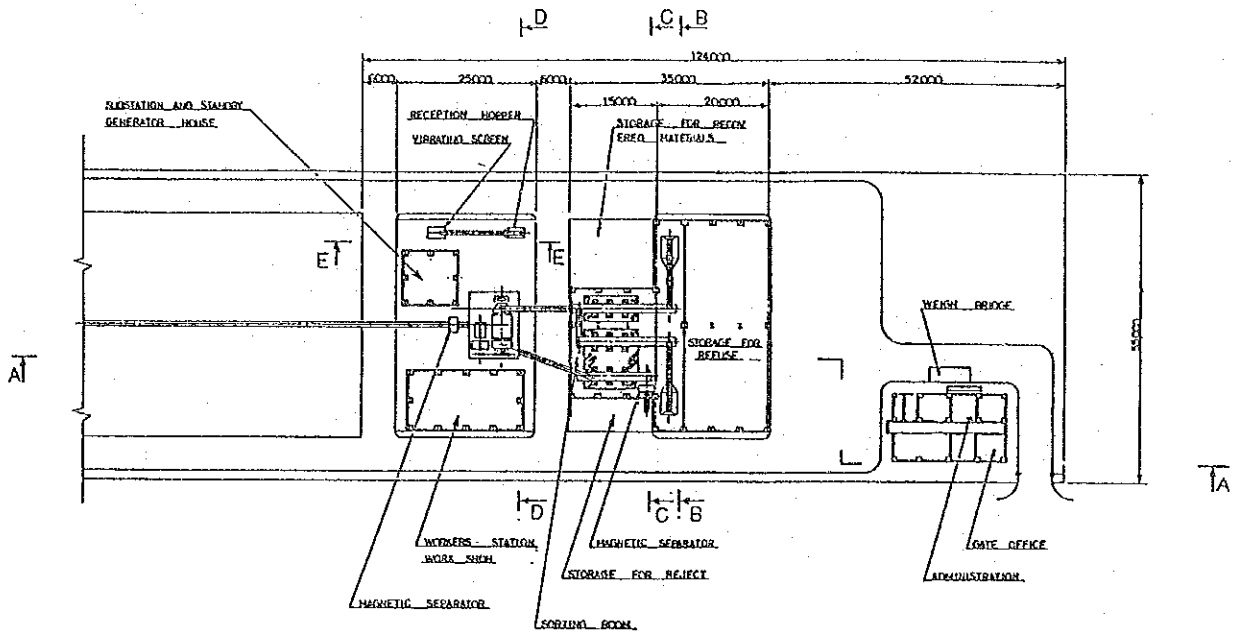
LAYOUT PLAN (Alternative)
